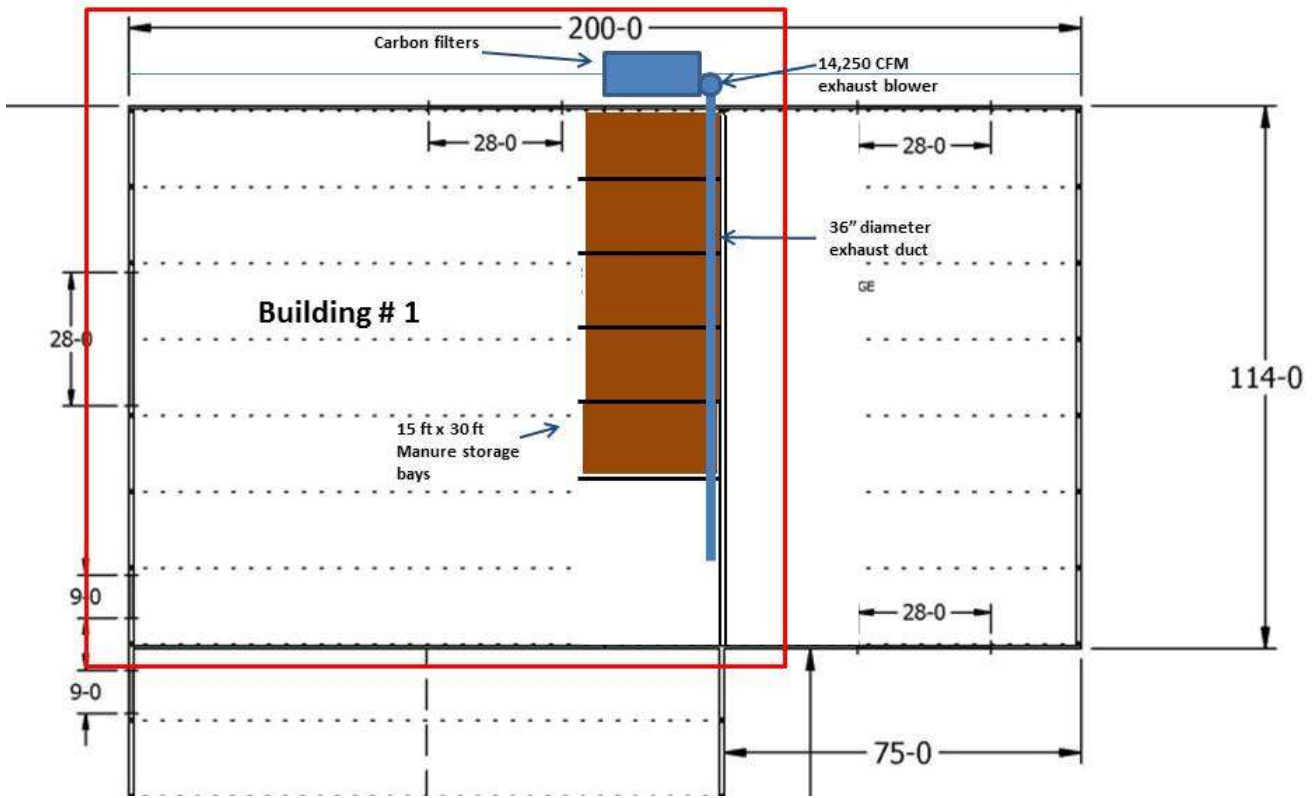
Plan view of building 1 showing the manure storage bays, the 36" duct, blower and carbon filter to mitigate odor.
